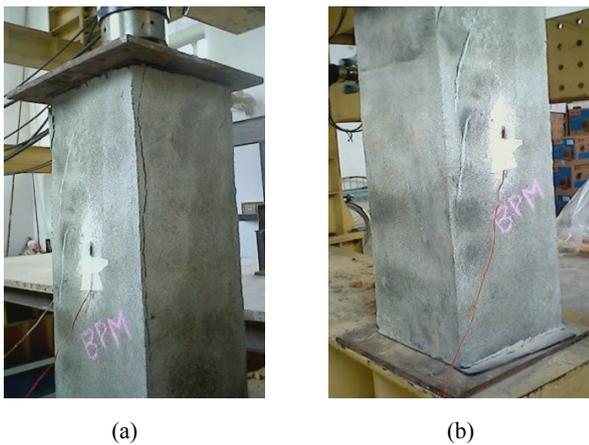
Cracks on plastered specimen (a) first crack at column's edge and (b) development of multiple cracks
